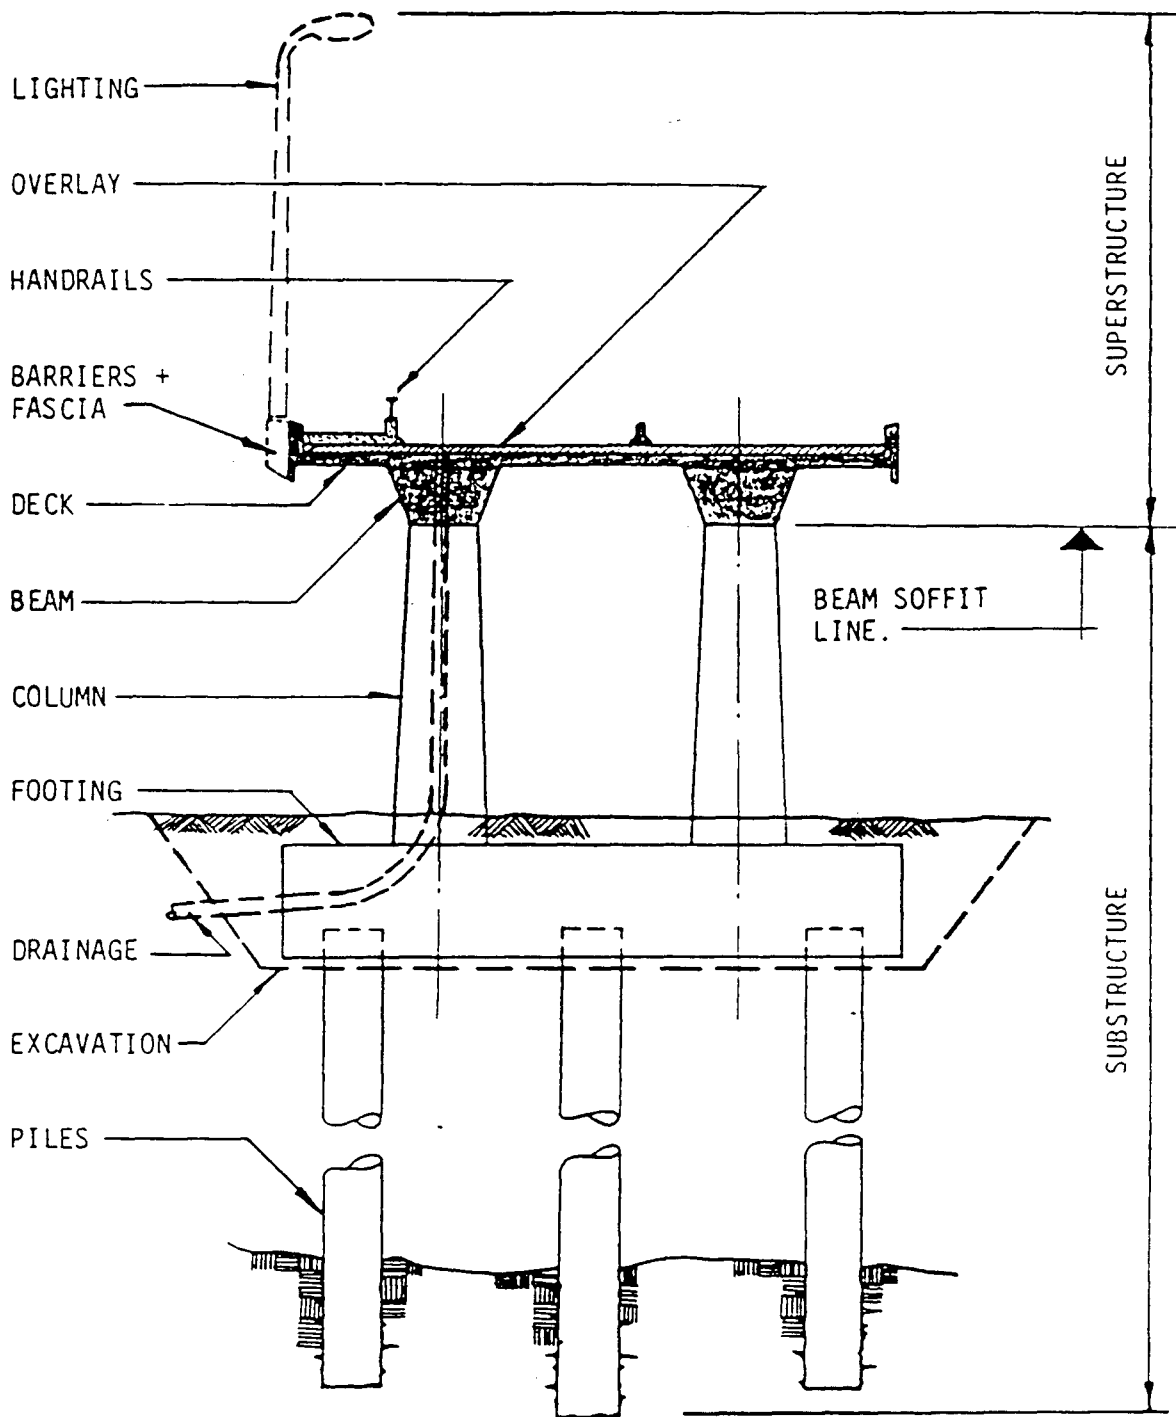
Section Through a Typical Concrete Bridge Showing The Activity and Project Level WBS Elements
